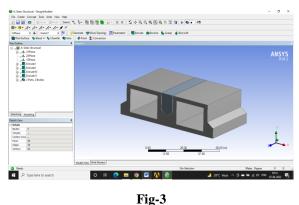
Model of box Girder Bridge and shear key provided in between two girders
